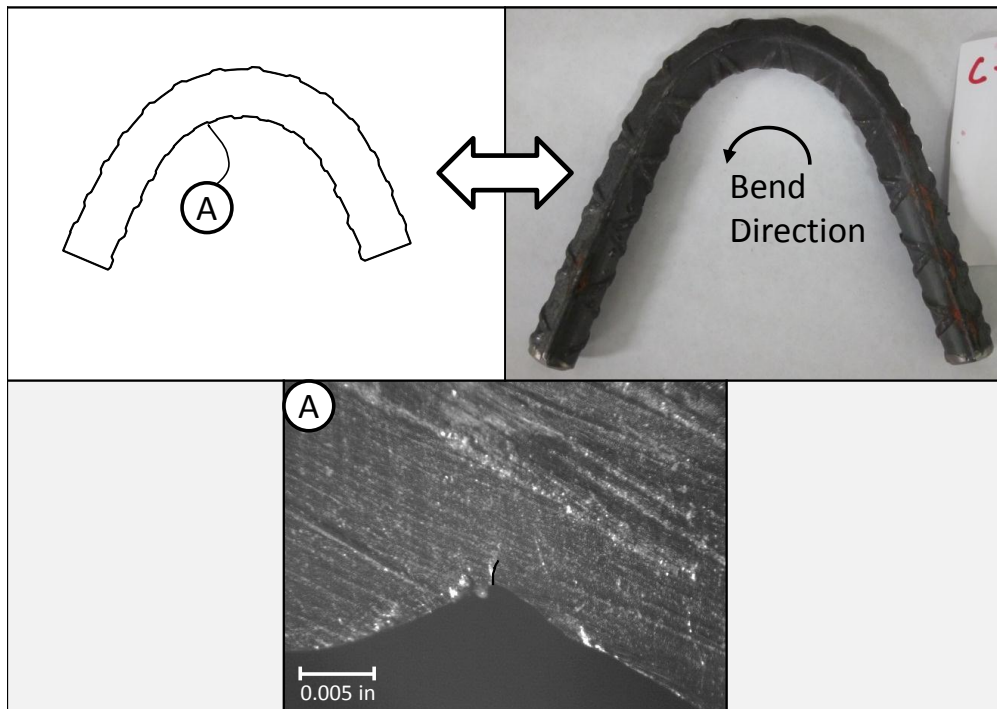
Cracks Identified After Bending for Specimen I-C-135-2.25-W
